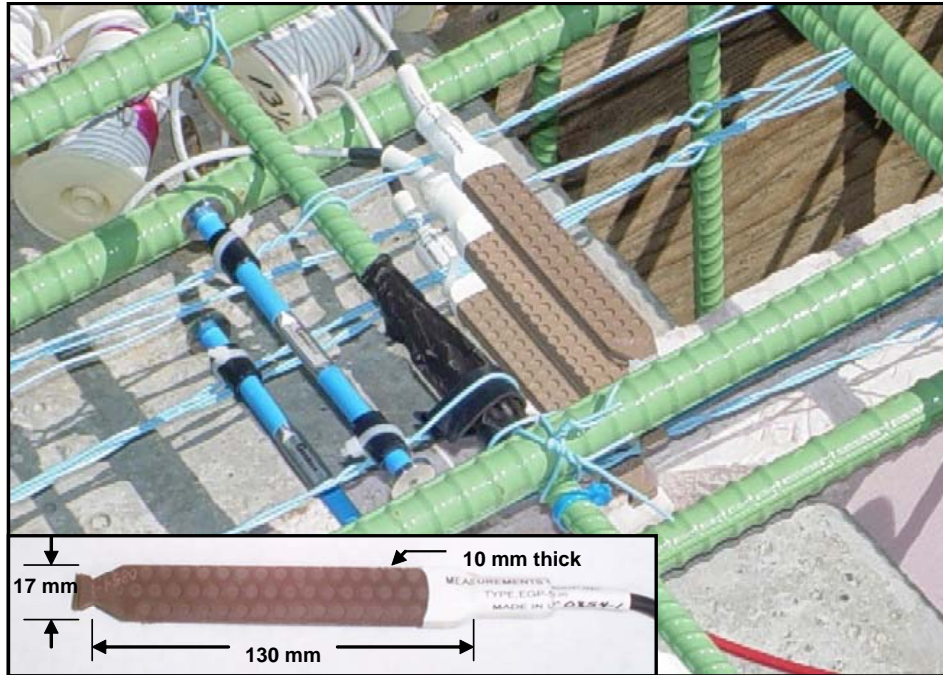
Concrete Embedment strain gage (EGP-5-350) installation; Inset: dimensions
